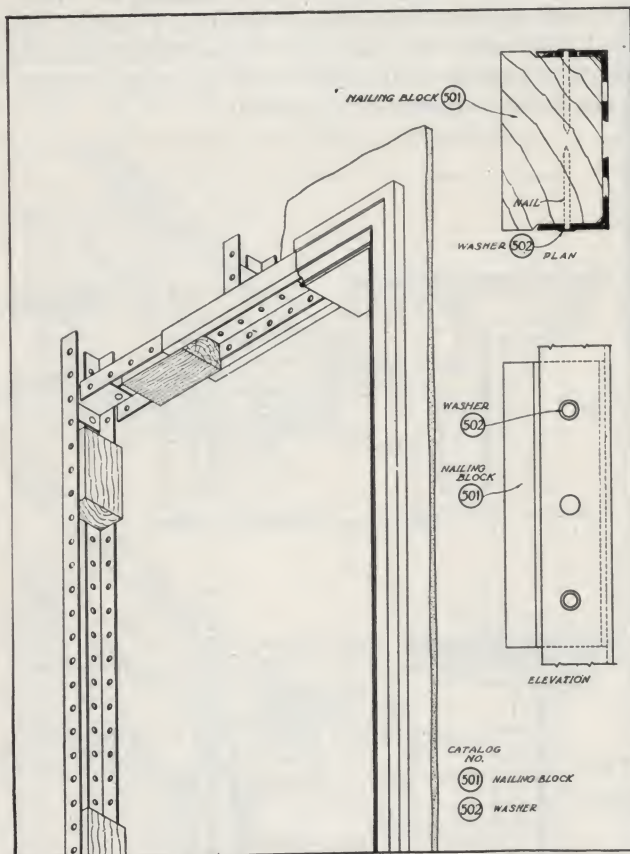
Nailing Blocks Installed in Door and Window Openings to Receive Frame and Trim
